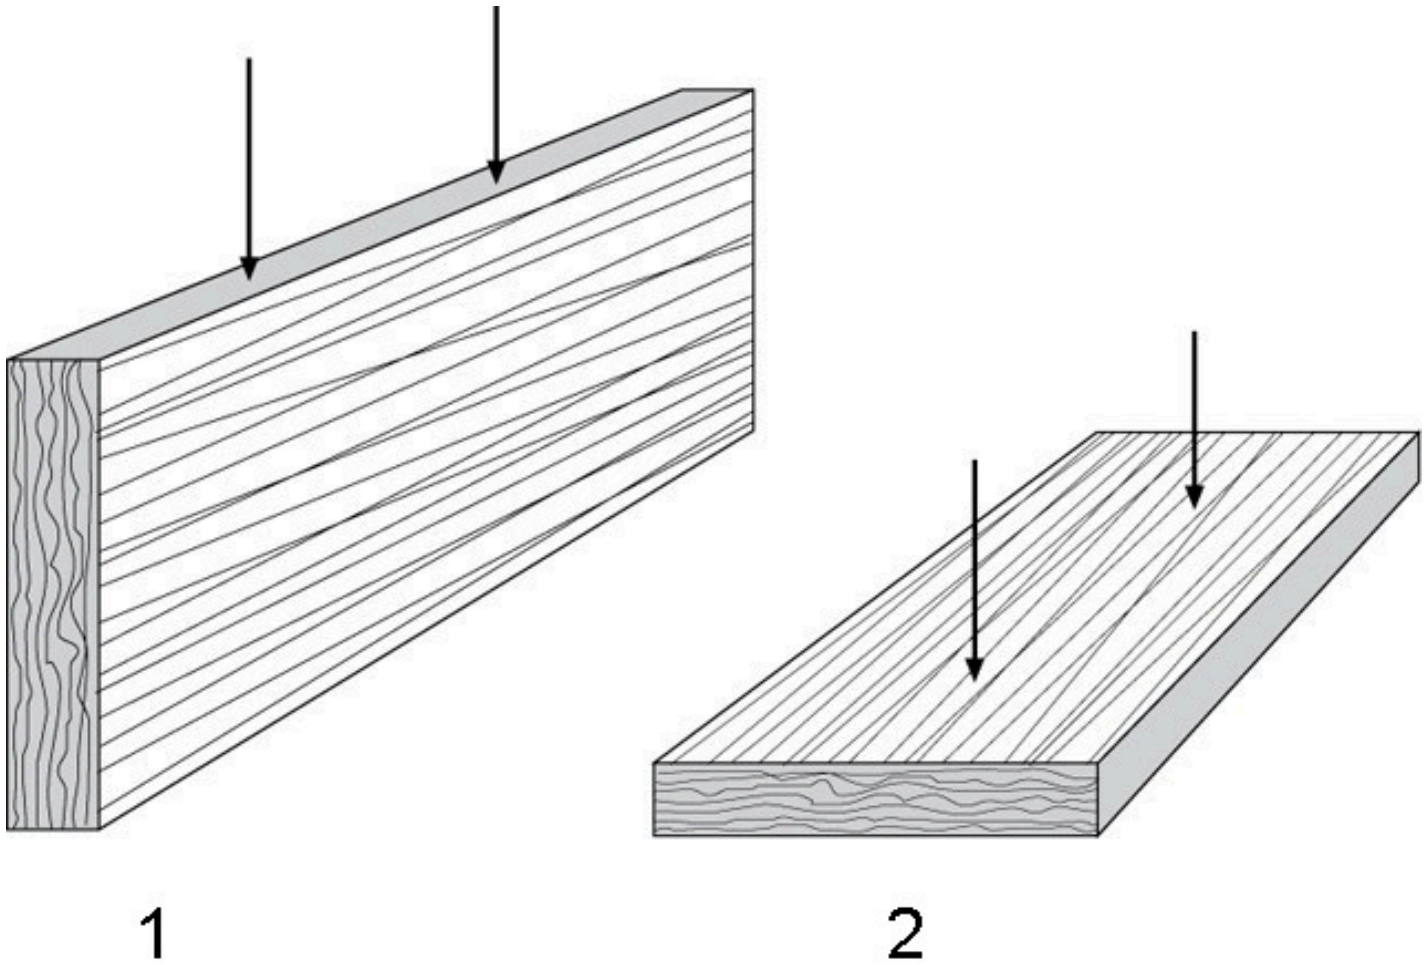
Load direction with respect to wide face strand (WFS) orientation
